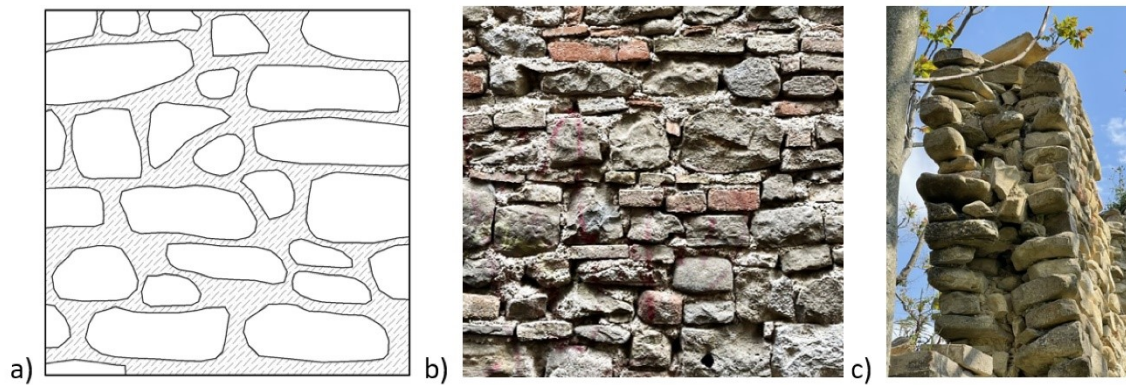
Disorganized rubble stone masonry (M1) – a) Graphic reconstruction of the wall texture type (1m x 1m); b) Wall façade example, photo taken in Arquata del Tronto (AP); c) Wall section example, photo taken in Treia (MC).
